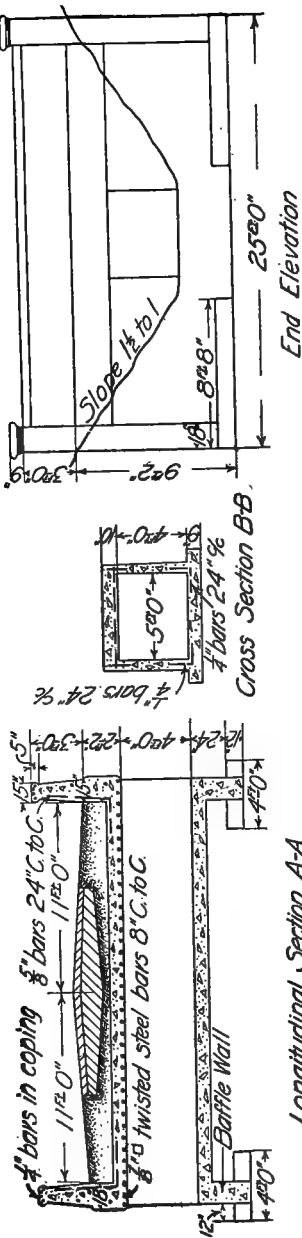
REINFORCED CONCRETE BOX CULVERT AT LENOX, MASSACHUSETTS.
